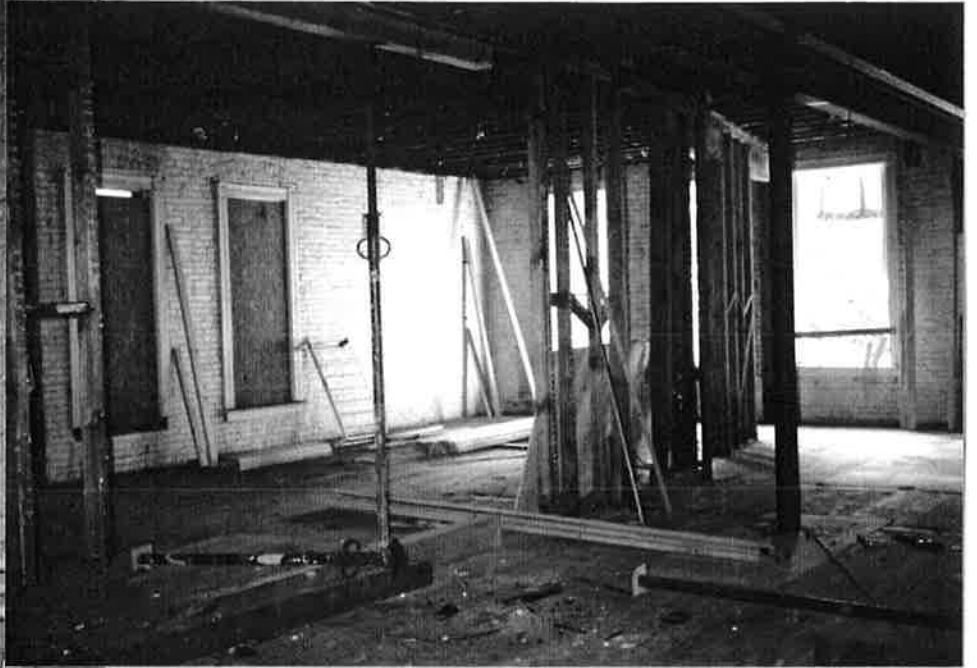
and 17: First floor, interior looking west at front of room towards Stevens Street, summer 1998.
